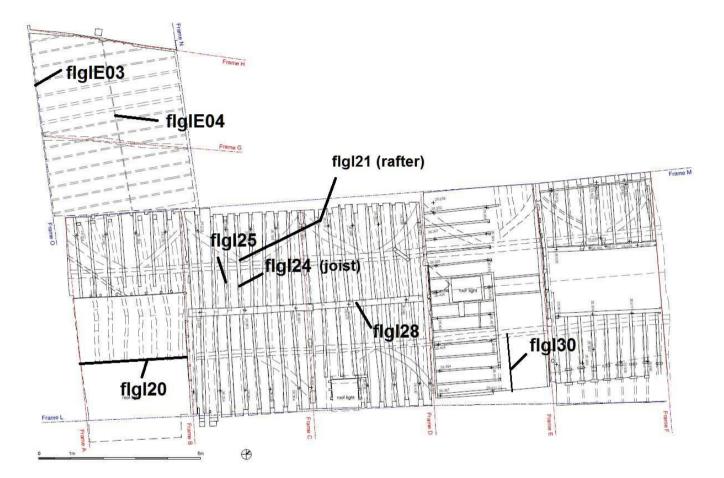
Plan of the roof areas of the main range and southern extension, showing timbers sampled (after Butler Hegarty Architects)
